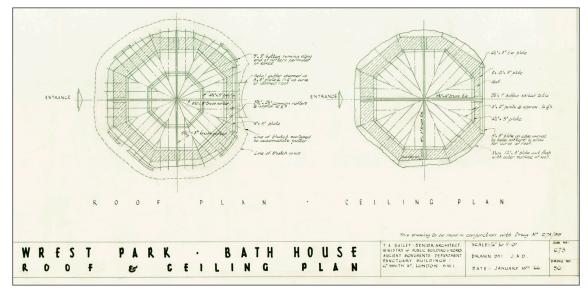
Plans of the roof and ceiling of the north room, 1966, by T. A. Bailey of the Ministry of Works (MP_WRE0084 Historic England Archive)
